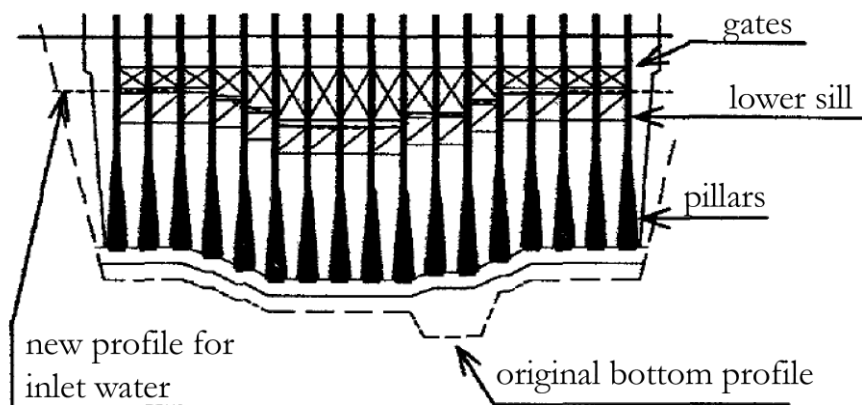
original and new profile [RIJKSWATERSTAAT, 1985a]
